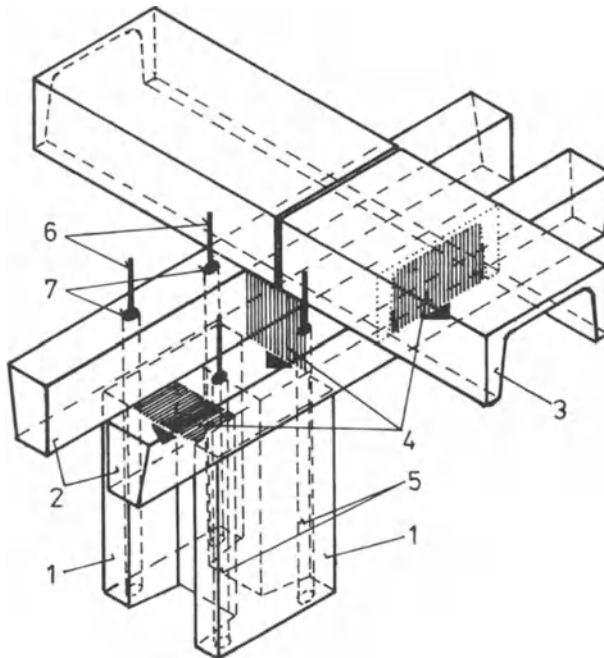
Main detail of skeleton—*isometric view*. (1) column with H cross section; (2) twin beams; (3) ribbed slab; (4) possible hidden piping and wiring; (5) vertical cavities; (6) connecting reinforcement bars; and (7) grouted mix Vusokret
